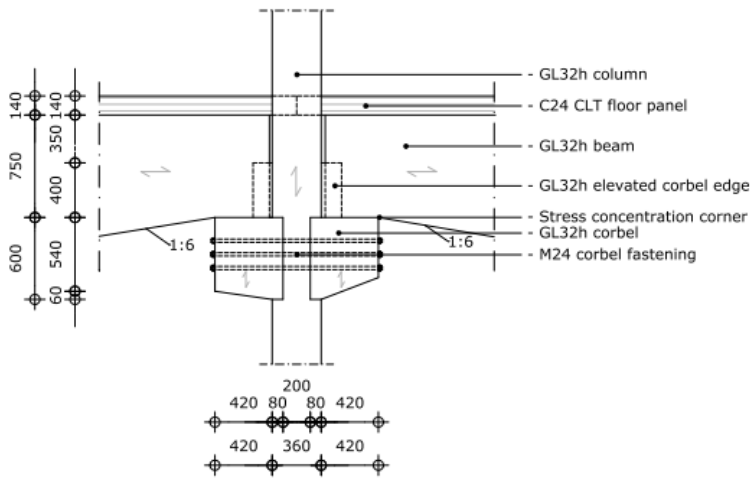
Cross-section E-E column-to-beam connection in mm
